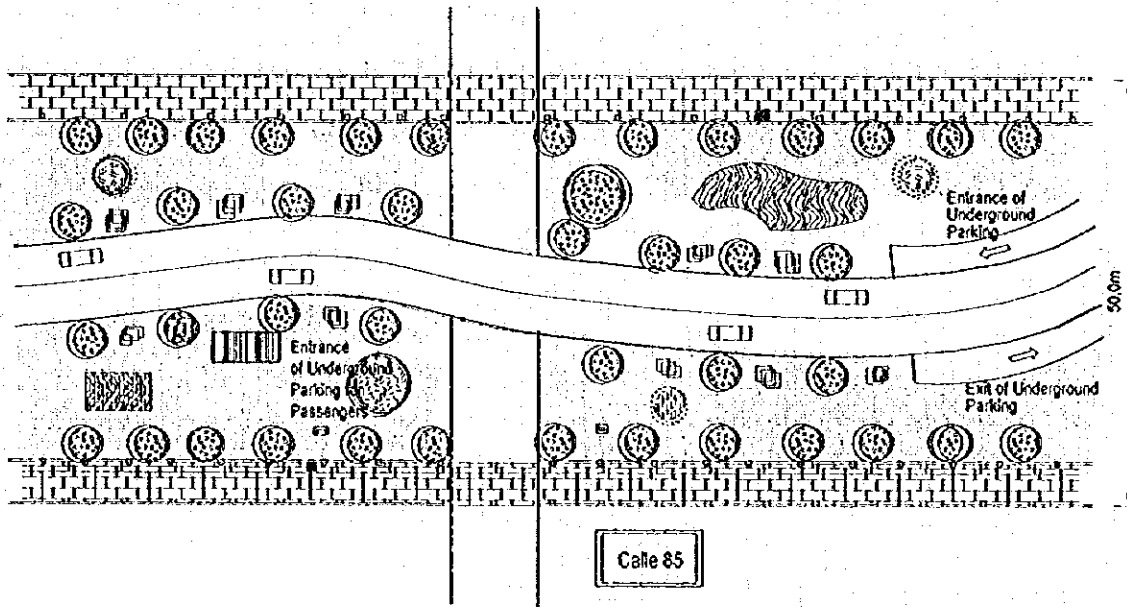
Typical Horizontal and Cross section (Calle 85)
